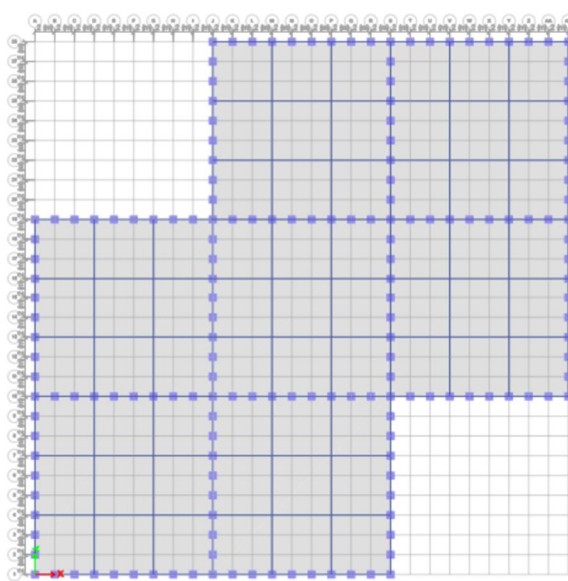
Plan of 11th to 20th storey of Bundled tube structure
